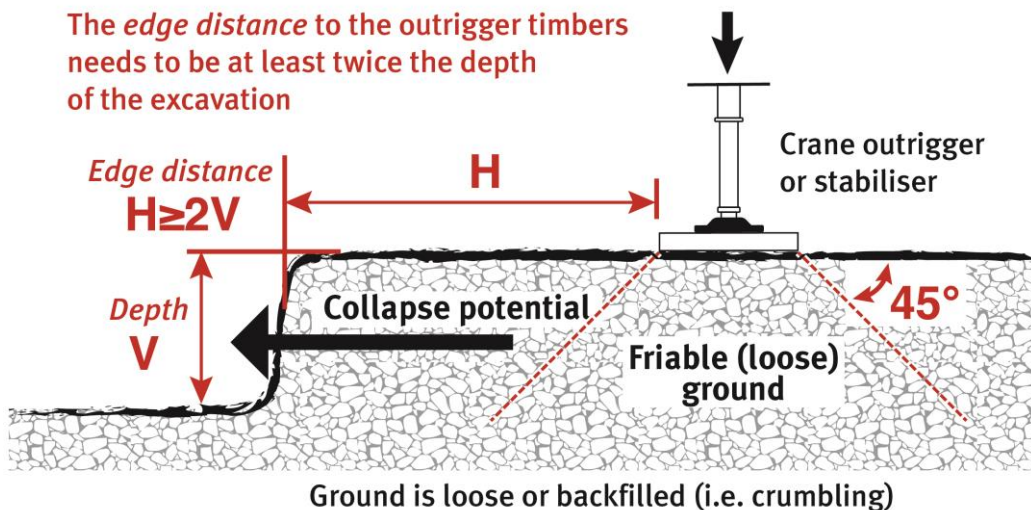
A three-metre-deep excavation in backfilled ground, the outrigger timbers or pads should be a horizontal distance of at least six metres away from the closest face of the excavation wall.
